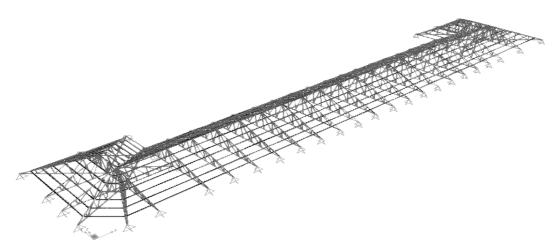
Three-dimensional space layout sources (Researchers Team)
